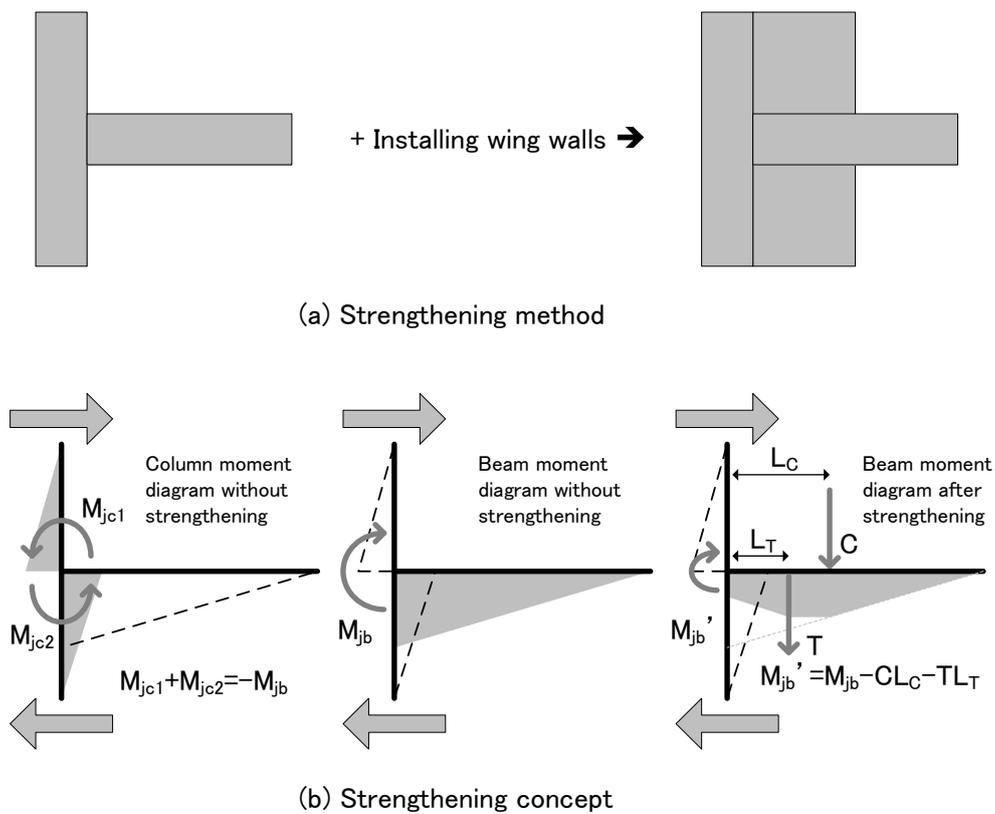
Concept to prevent joint failure by installing wing walls.
